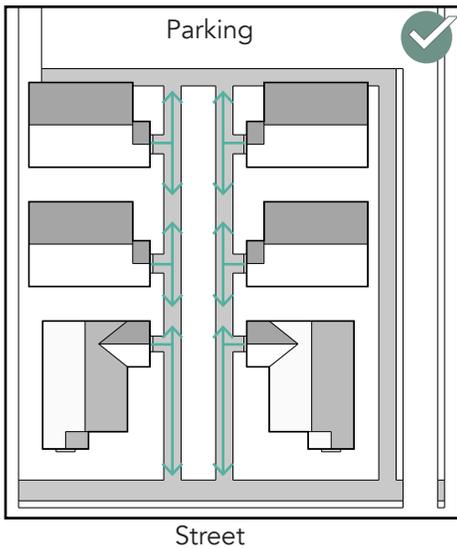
Where multiple units are located on a site, create an internal walkway system that connects to key areas such as building entries, parking areas, service areas and open spaces.
